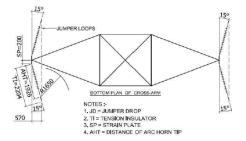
Plan view of Line Clearances of TD3 Tower
